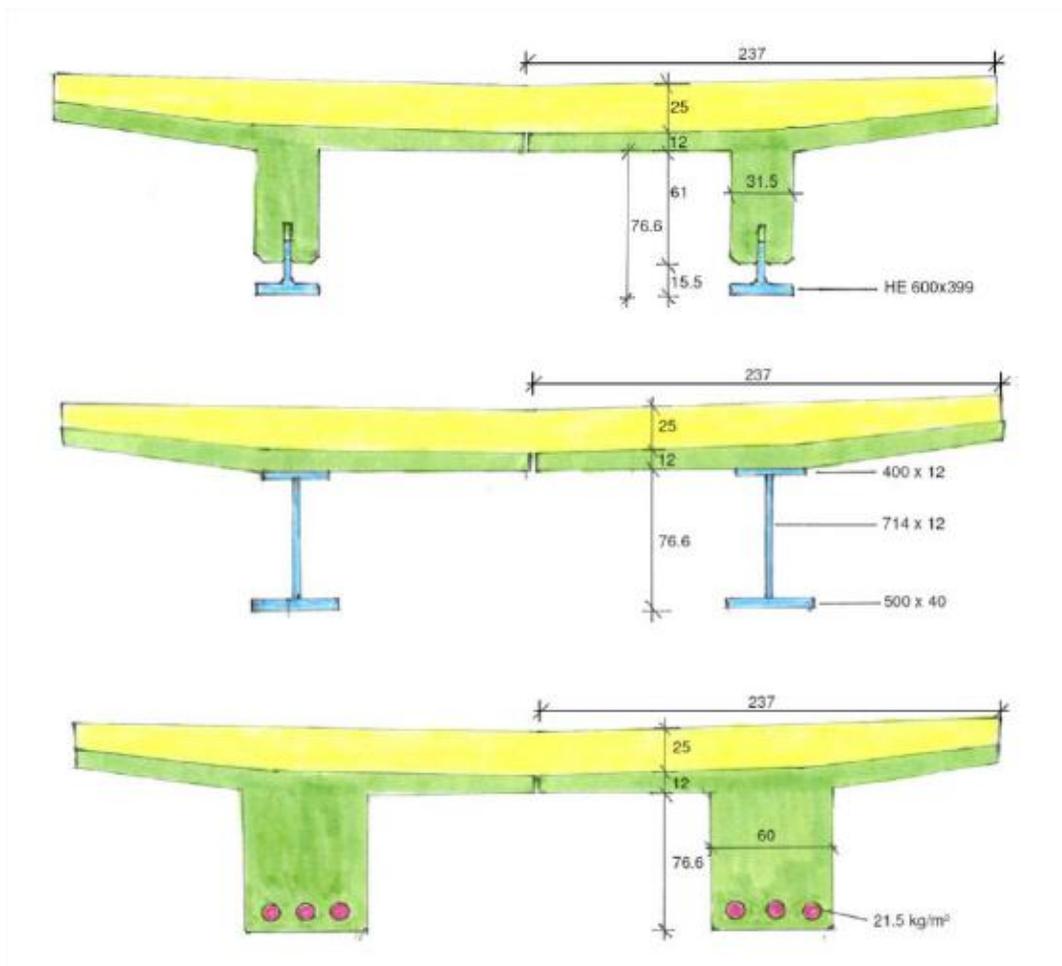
Dimensions of Preco-Beam girders for Vigaun-Bridge and of preliminary design for VFT and pre-stressed girders
